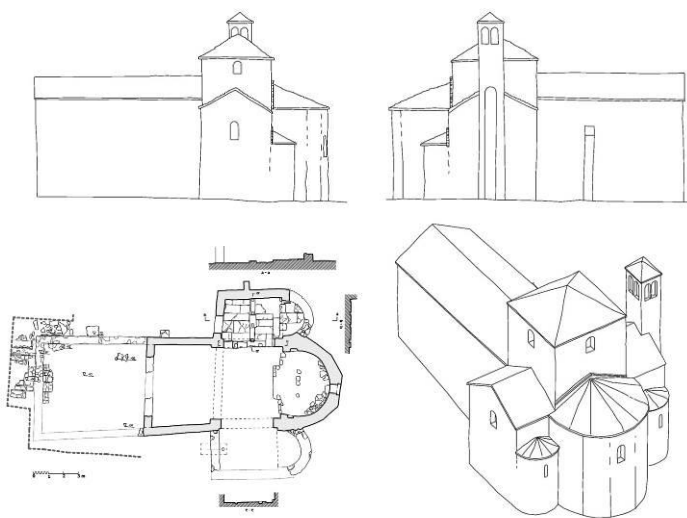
Church of St Thomas near Rovinj, floor plan and the proposed reconstruction
